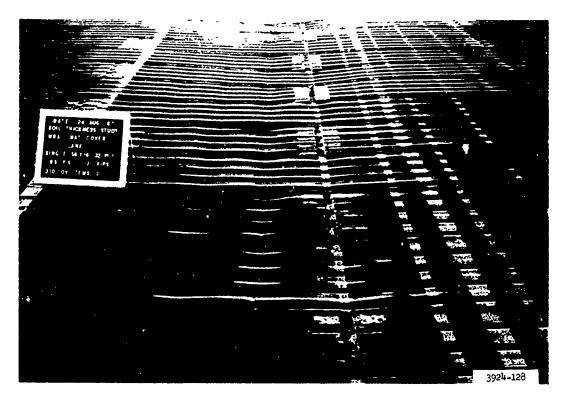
Test section I, lane 1, item 2, prior to traffic
